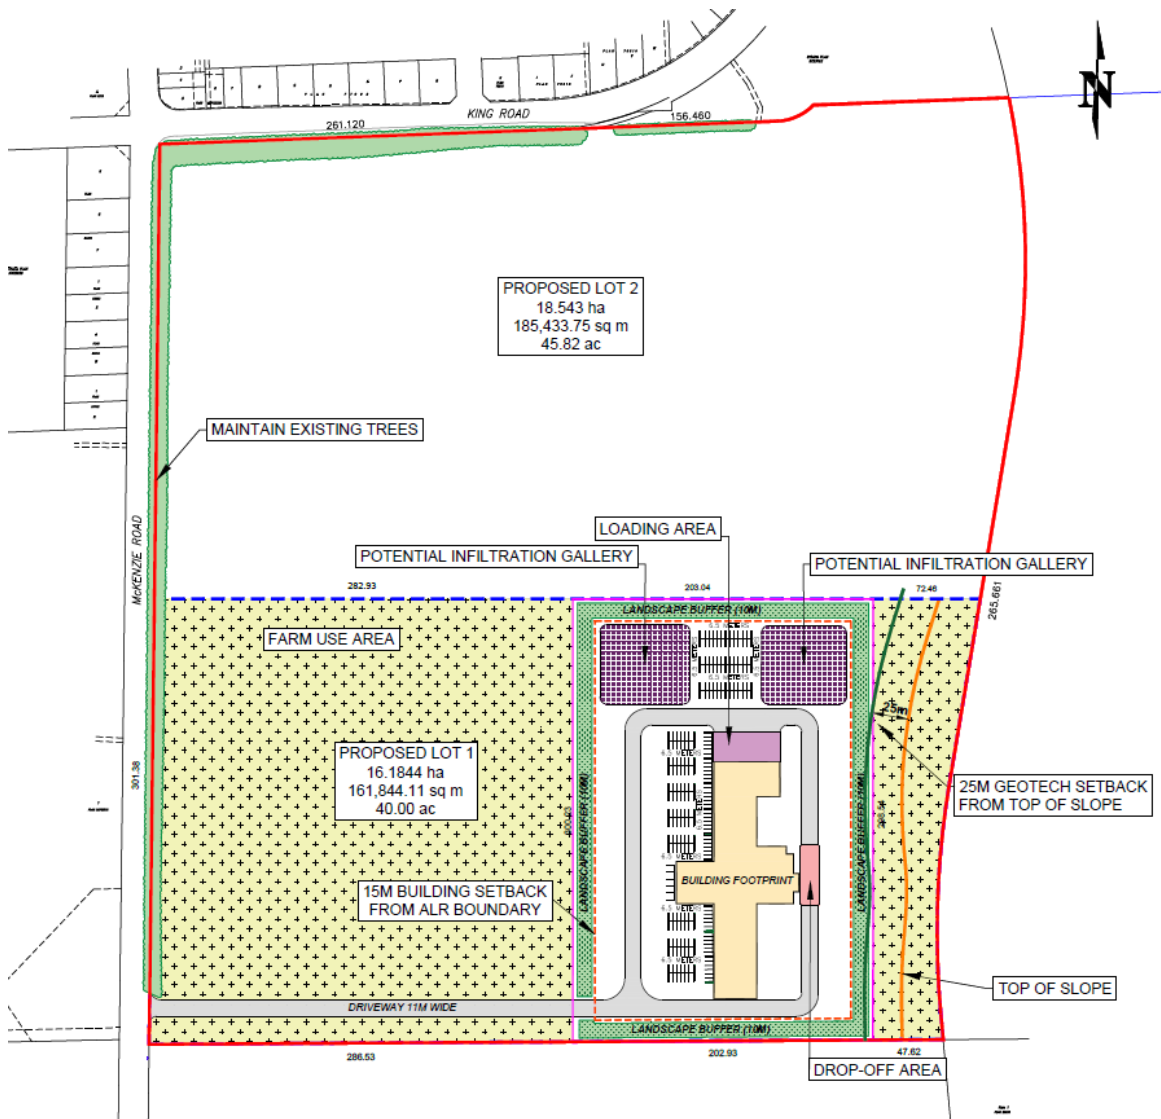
Proposed Conceptual Site Plan for PAHC Facility (see Appendix G)
